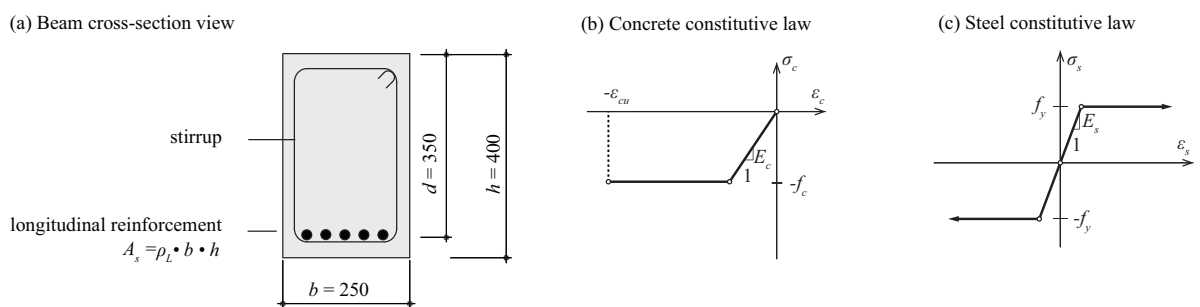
(a) Cross-section (unit of dimensions: mm); (b) concrete constitutive law; and (c) steel constitutive law.
